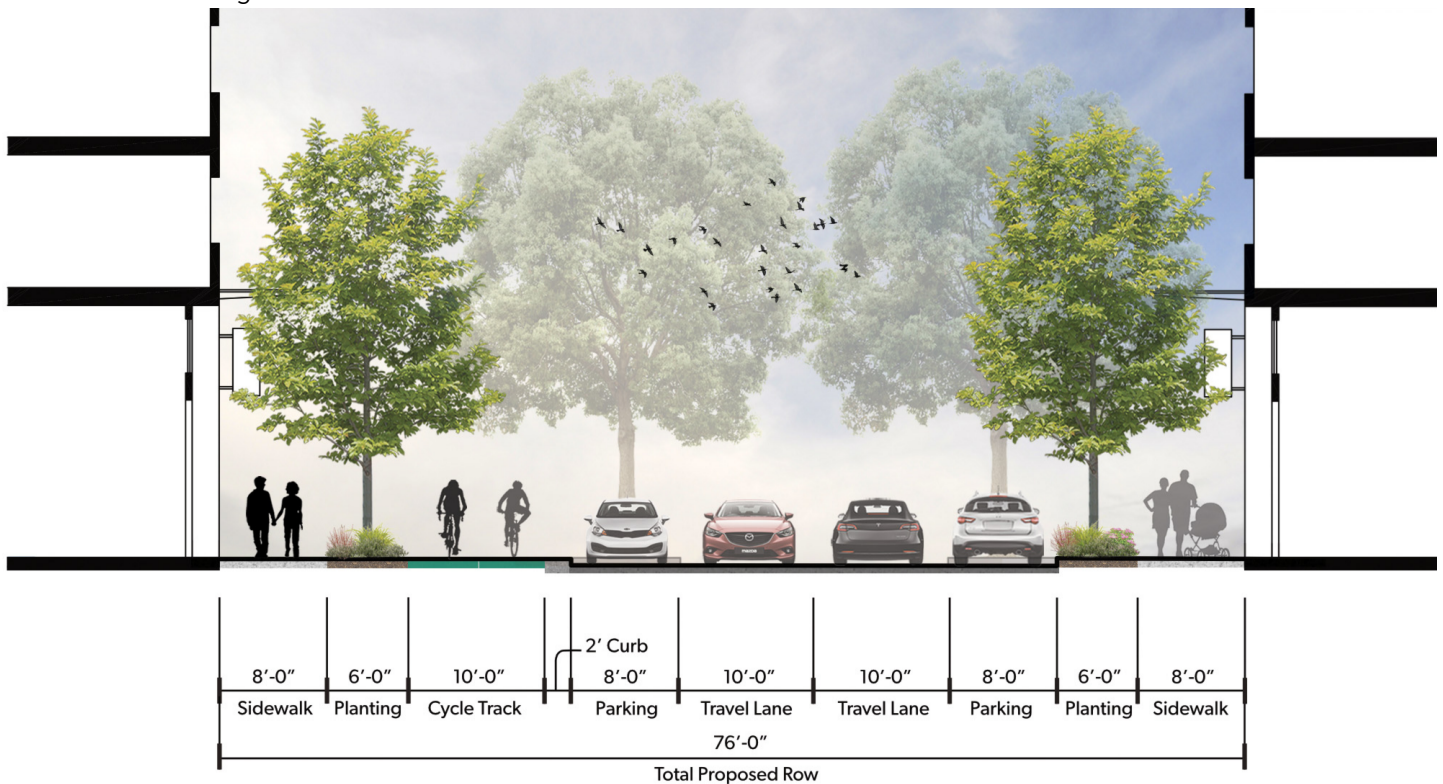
I-I | Main Street Extension at Park (Formerly Mill Creek Blvd)
